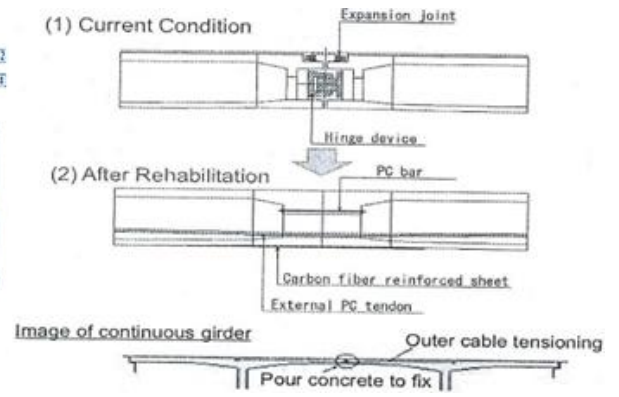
Existing damaged hinge to be fixed and repaired (Meghna and Gumti).
